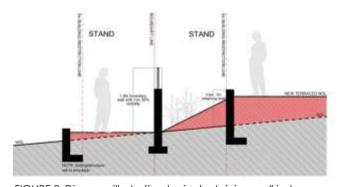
\_Diagram illustrating typical retaining wall instances on lateral sides of erven
